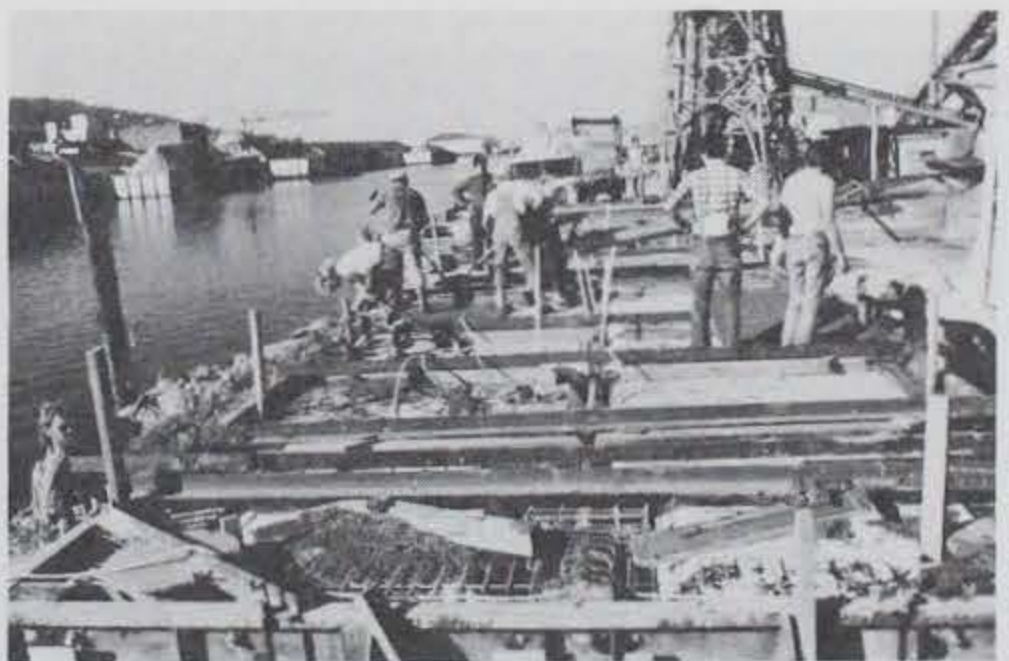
Steel angles, 2 by 4's, and PVC pipe being used to keep styrofoam located properly.
